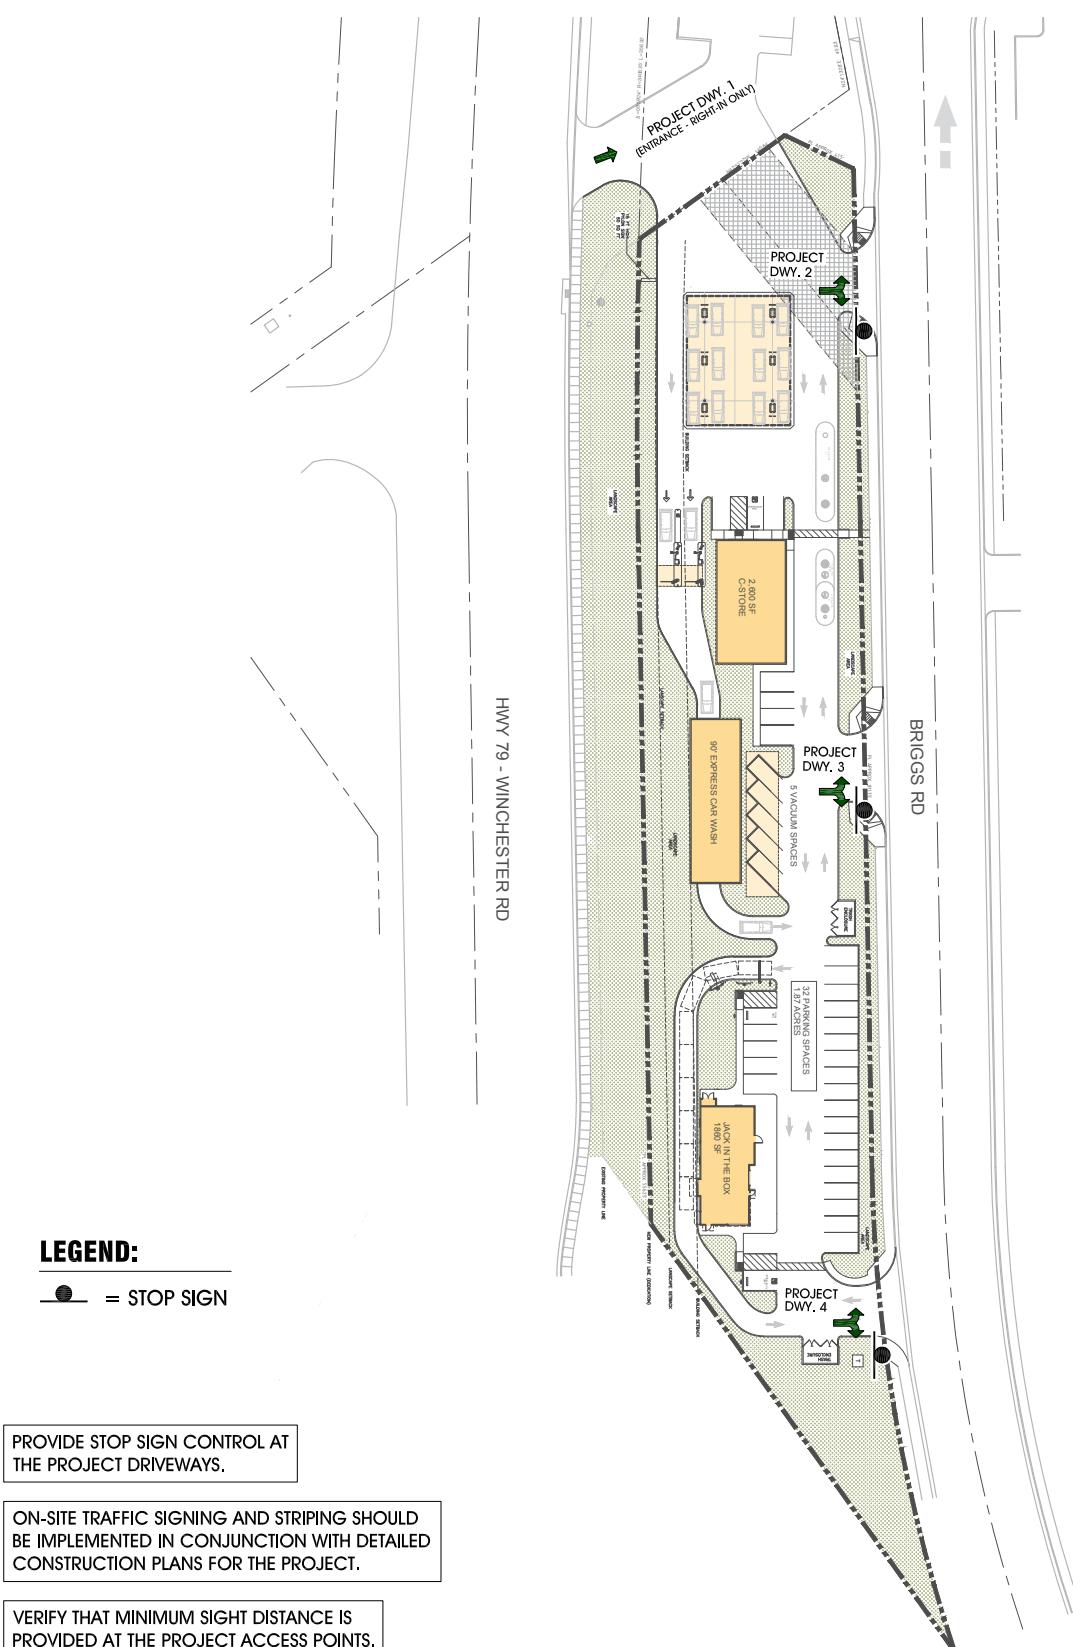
C illustrates the on-site recommended lane improvements. Construction of on-site improvements shall occur in conjunction with adjacent project development activity or as needed for project access purposes.
